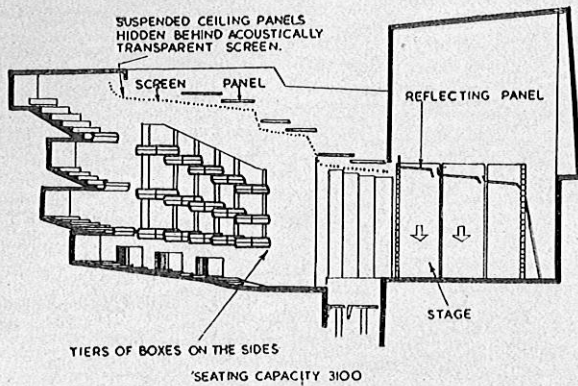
Sectional Elevation of the LA GRANDE SALLE, PLACE DES ARTS, Montreal, showing suspended ceiling panels required for short-time delay reflections. The space above the panels is used to support reverberation.
